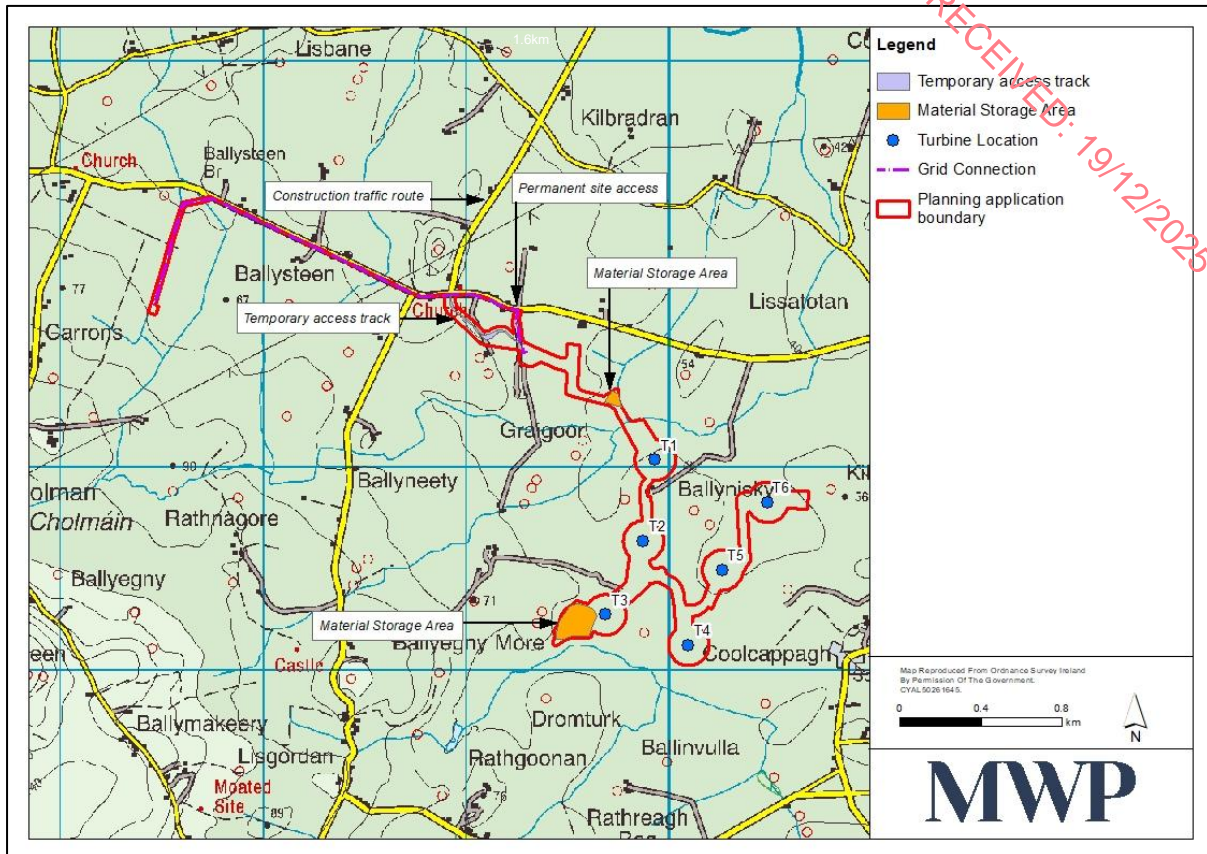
Proposed Temporary & Permanent Site Access Locations
